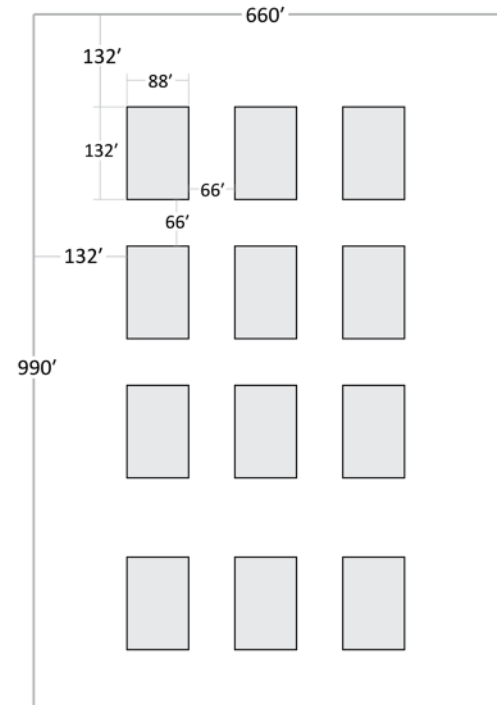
A 660' x 990' block contains 12 multipurpose buildings. With a 132' setback from the street and 66' between each building, the building footprint measures 88' x 132'.
